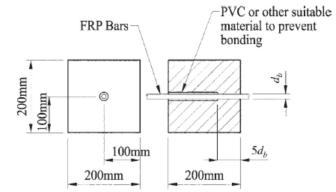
Concrete pullout bond specimen layout and specimen
